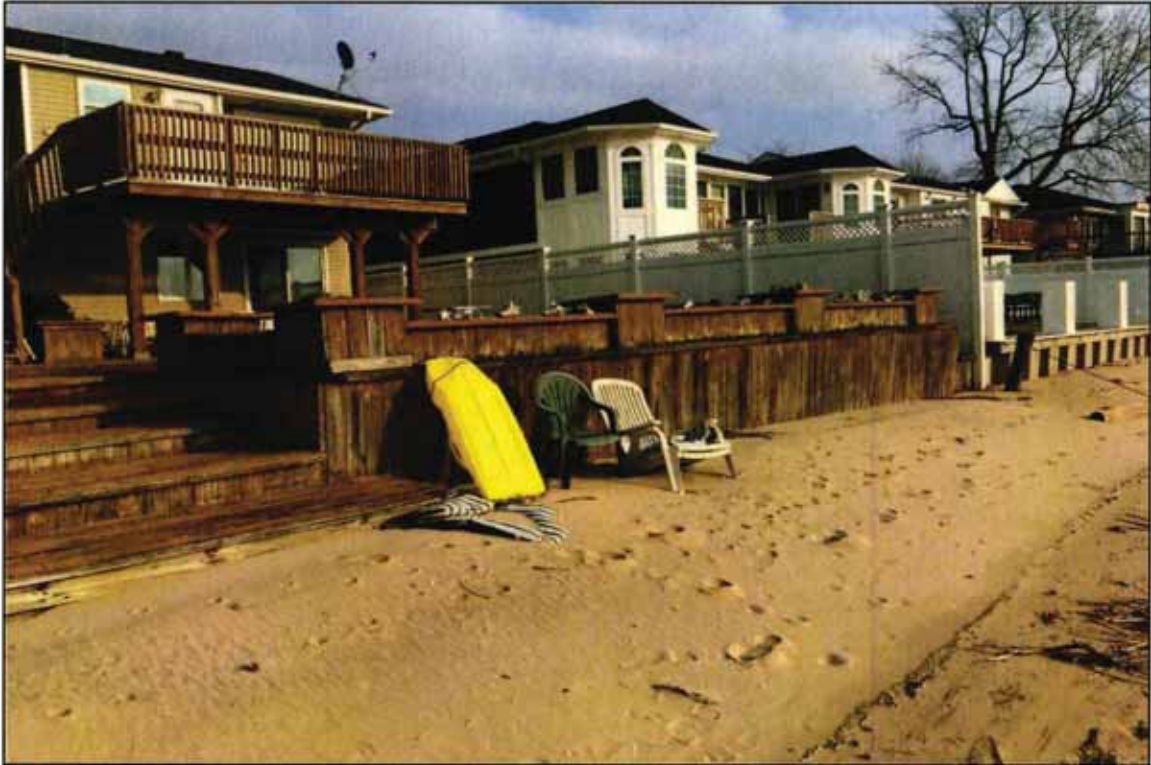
Timber bulkhead and decking looking southeast. (1 of 2)
